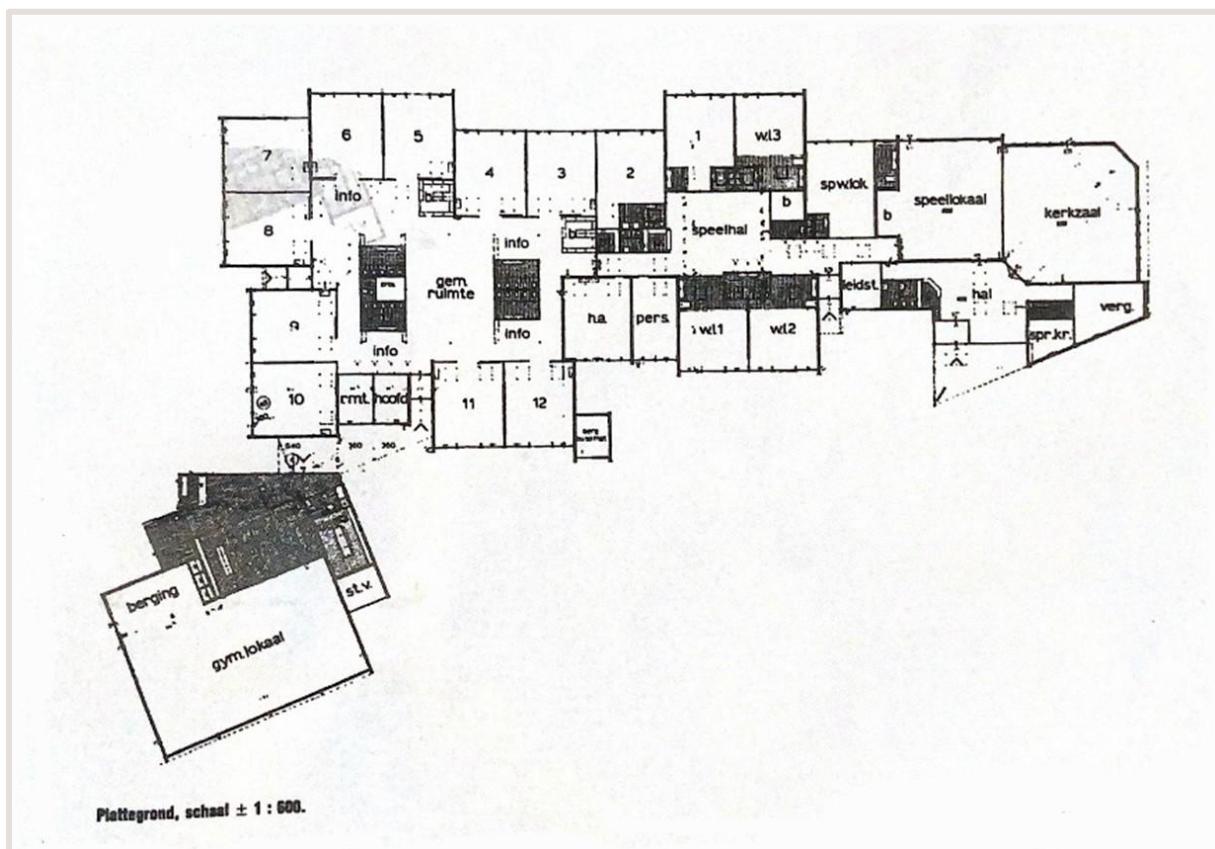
floorplan school-church Zevenkamp (Van der Hout, 1985)
